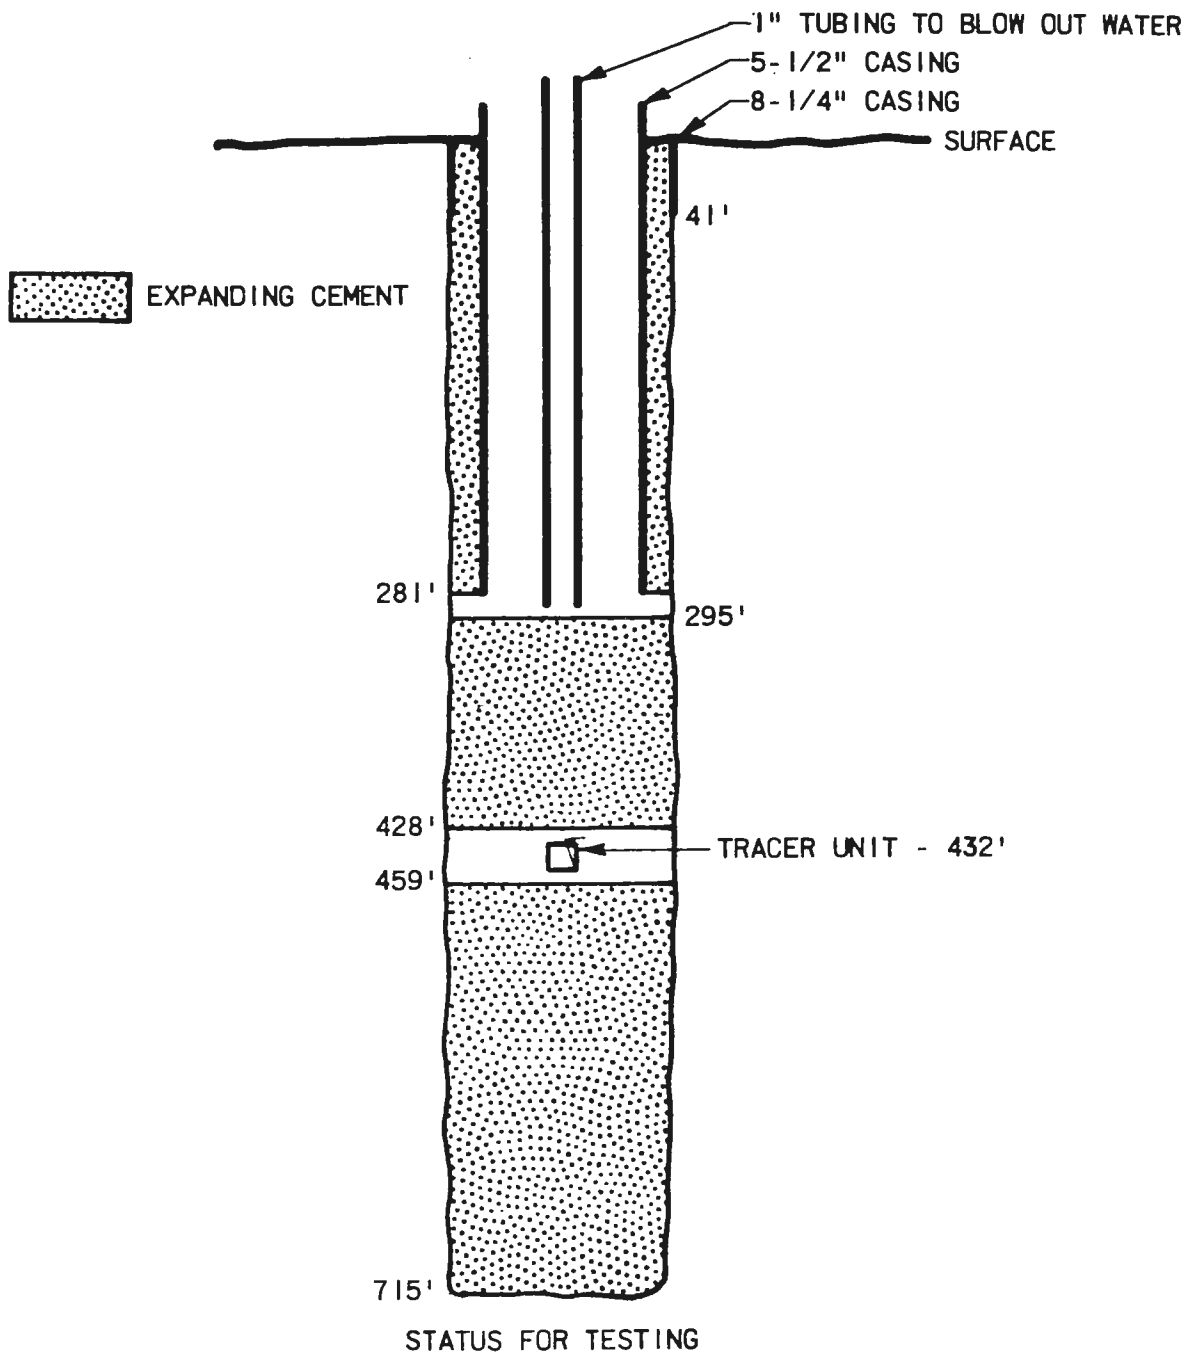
SOUTHERN OHIO COAL CO. WELL NO. 1049,
